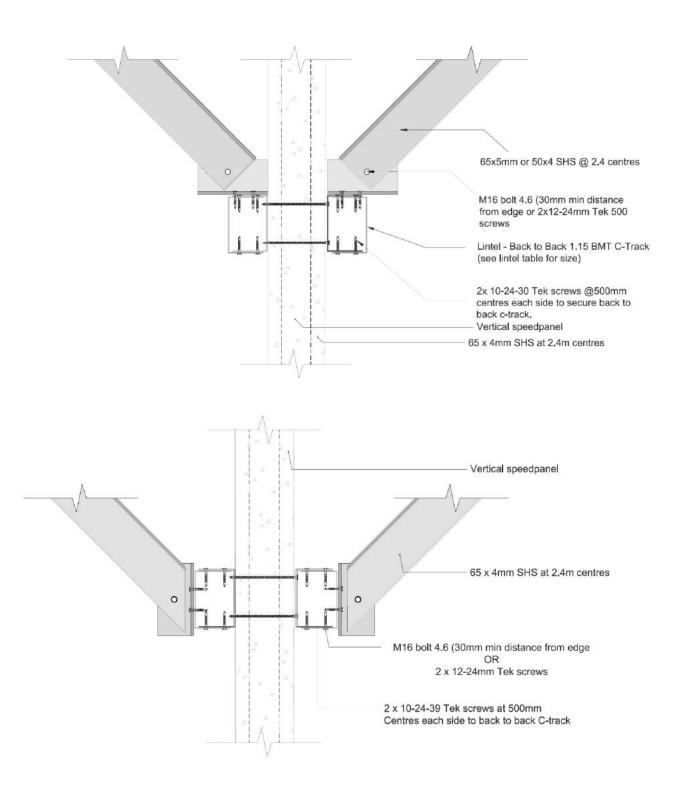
Unprotected Lateral bracing required on both sides of wall
